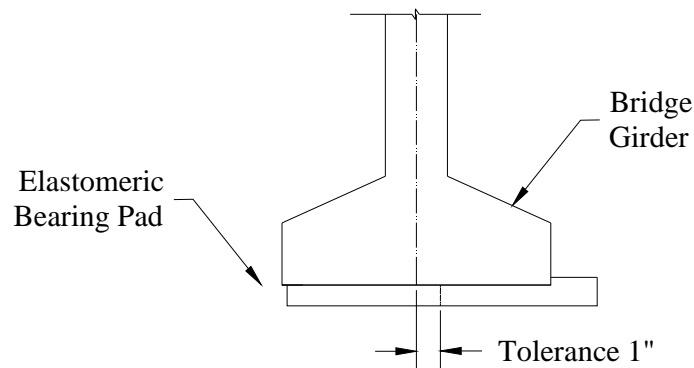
Offset of girder and bearing pad centerline tolerance
